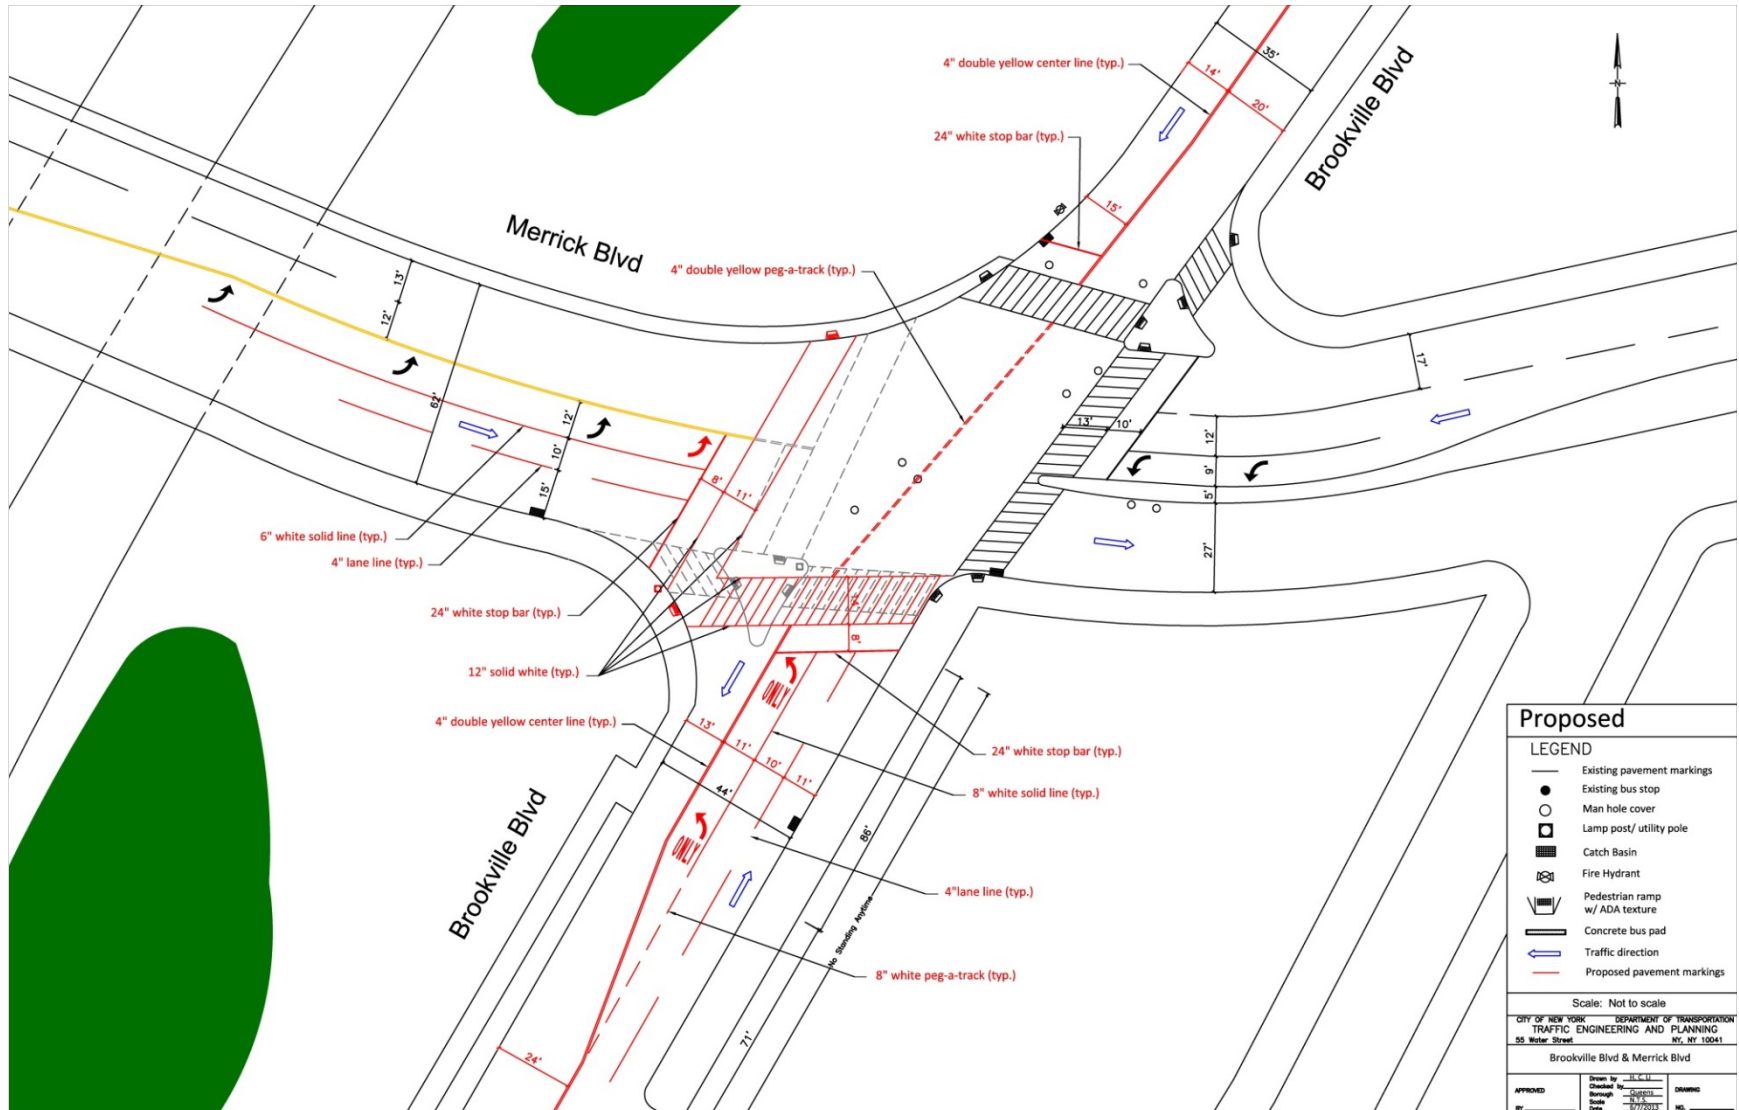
Merrick Boulevard and Brookville Boulevard - Proposed
